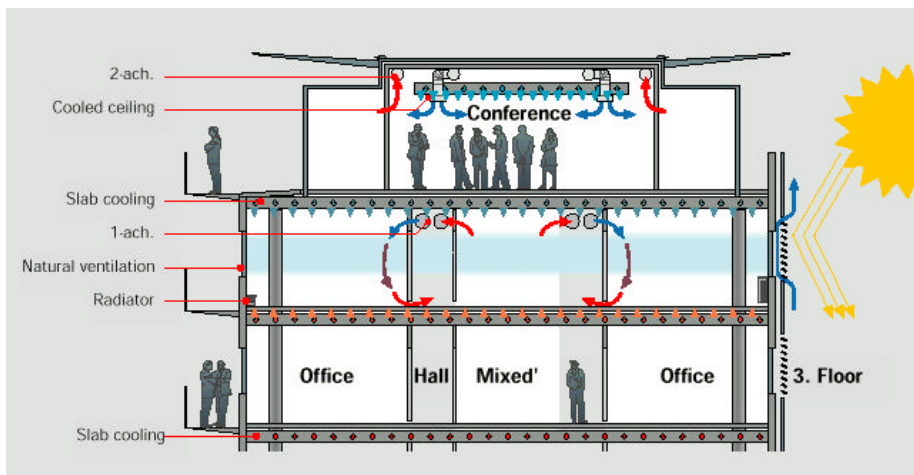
Office building in Munich with concrete slab heating/cooling, ventilation system, outside sunscreens and radiators.
